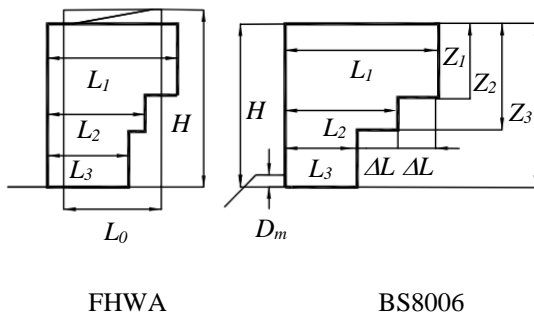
Dimensioning uneven reinforcement lengths wall guided by FHWA [1] and BS0006 [2]
